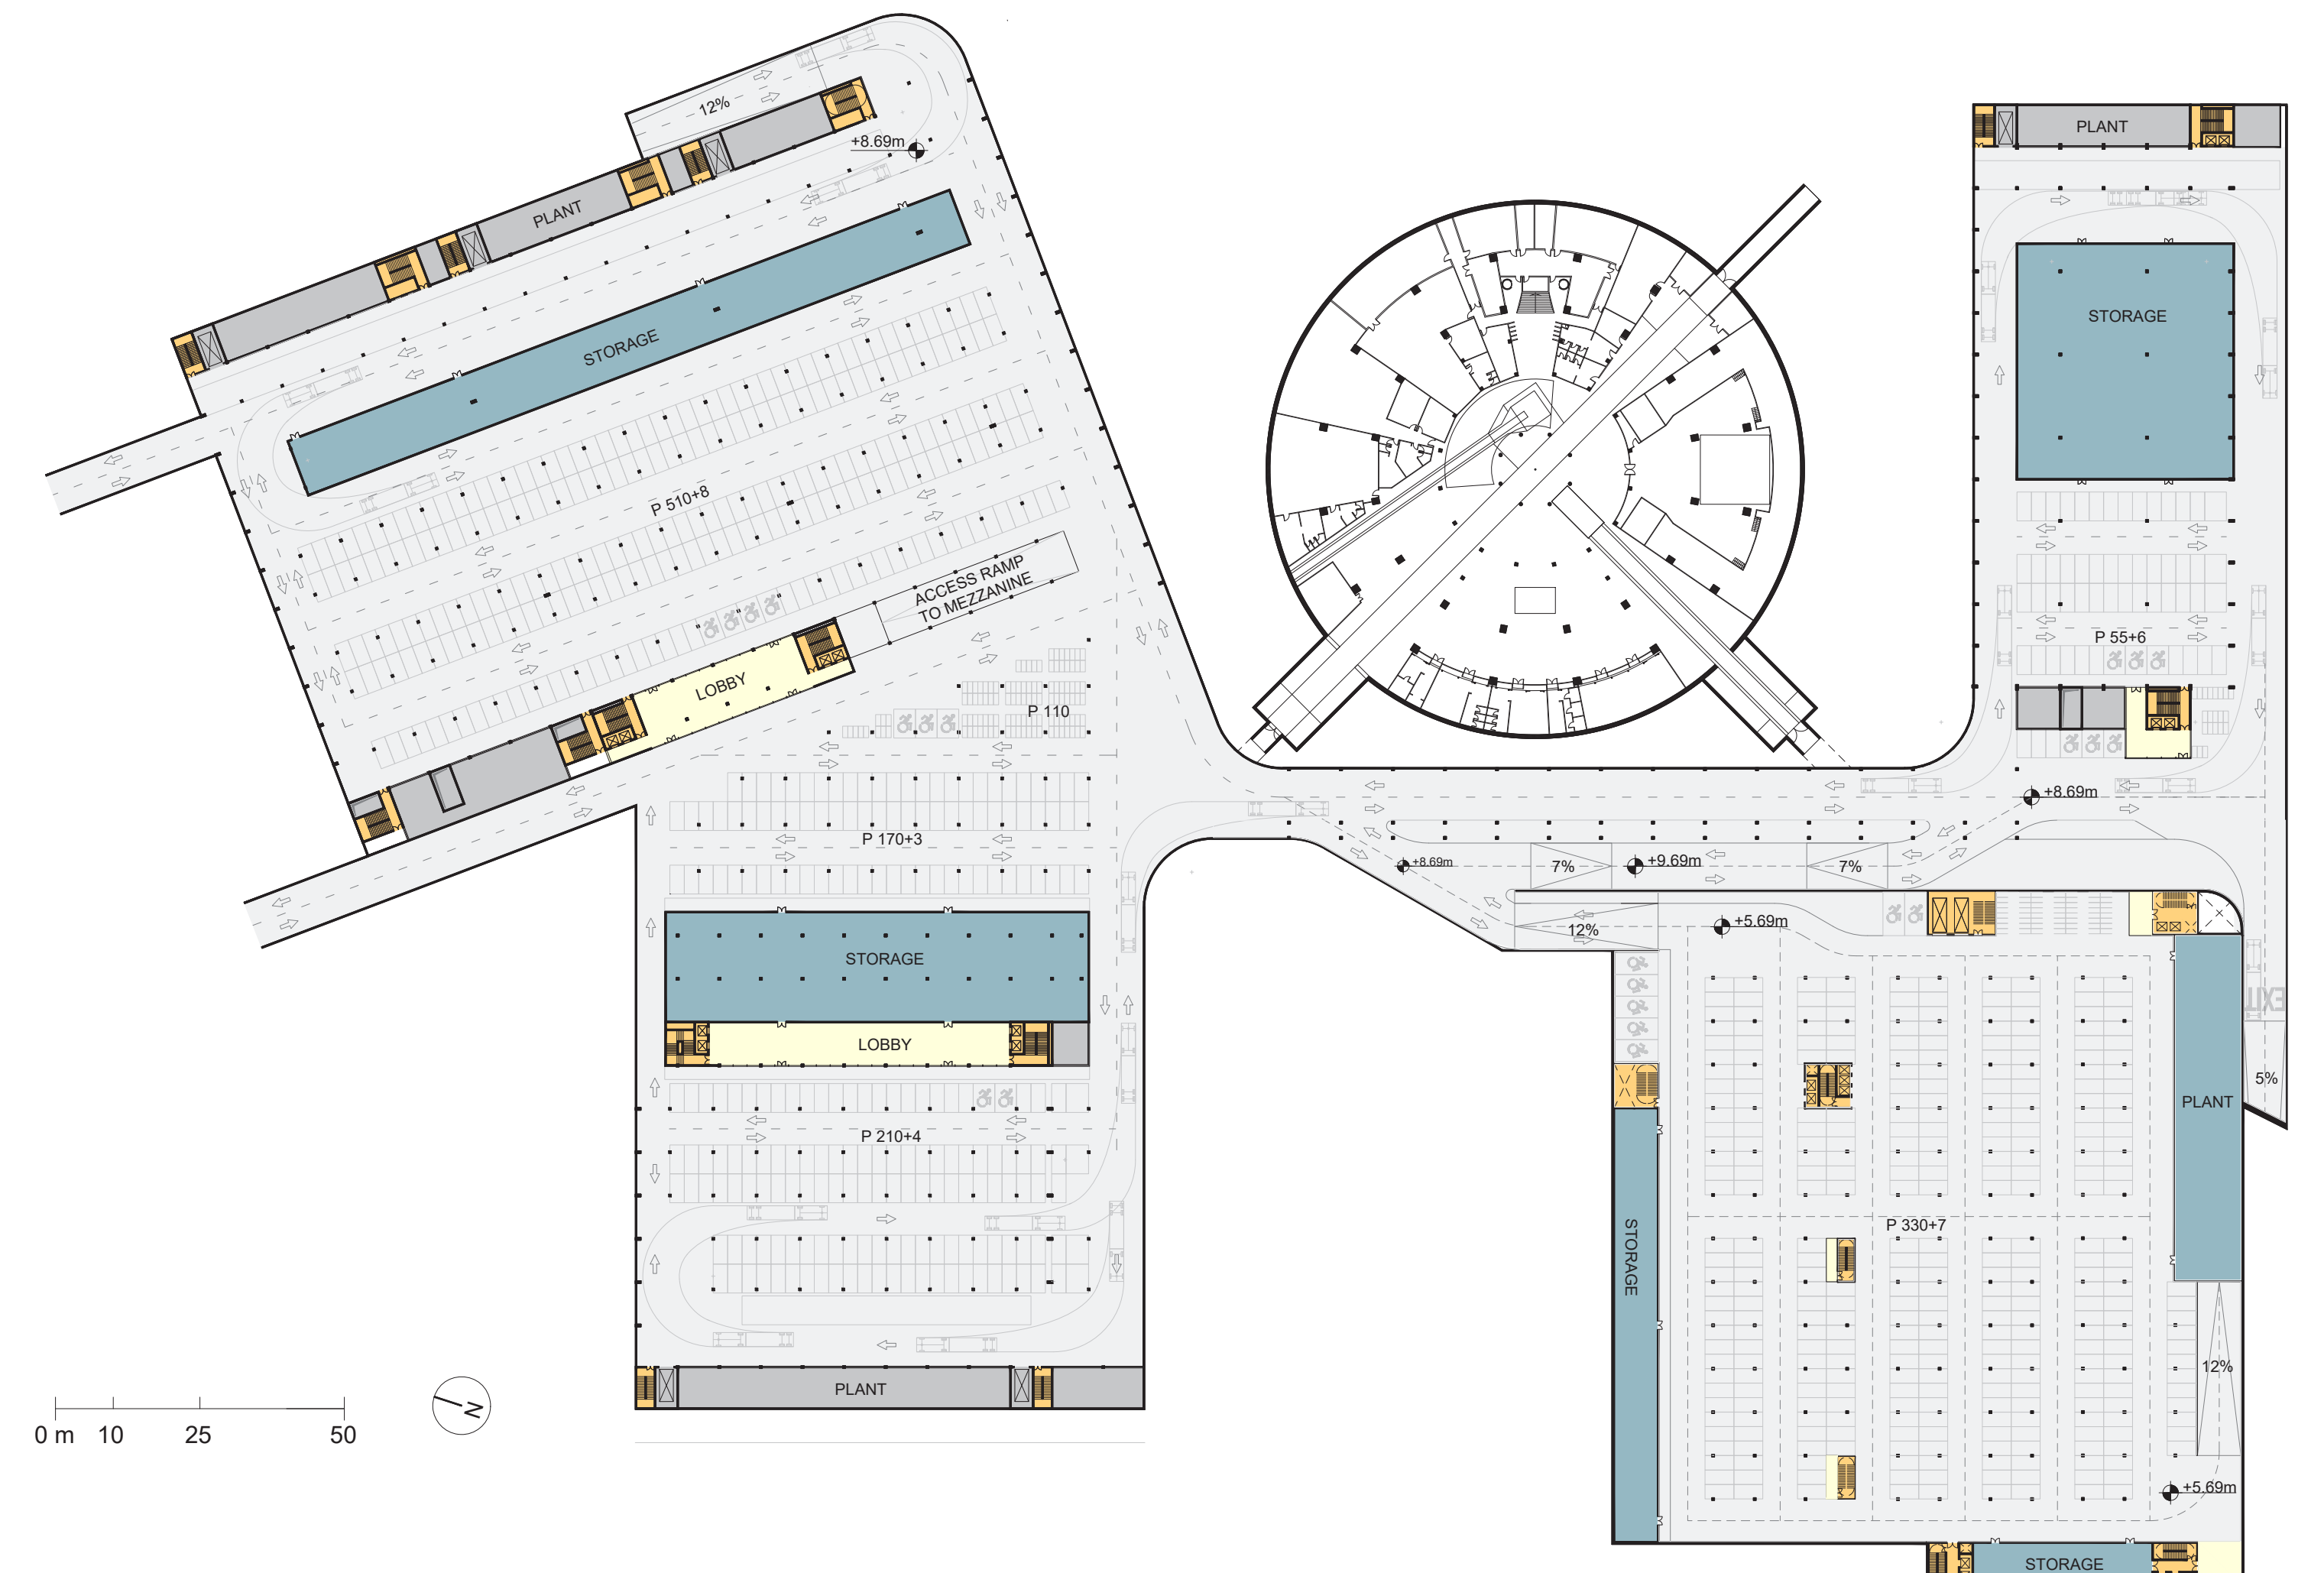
EXHIBITION CENTRE - LEVEL 1 PLAN - SCALE 1:500
